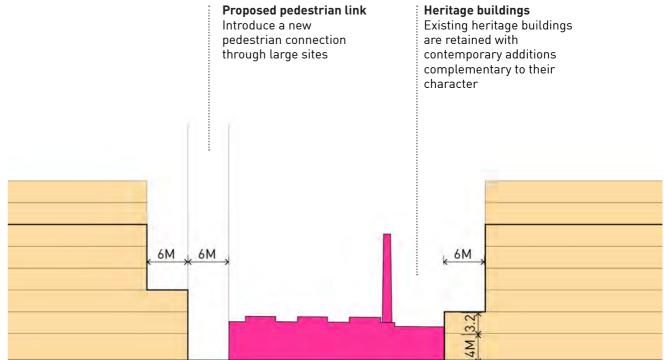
Proposed built form envelopes (elevation) in response to existing heritage building
